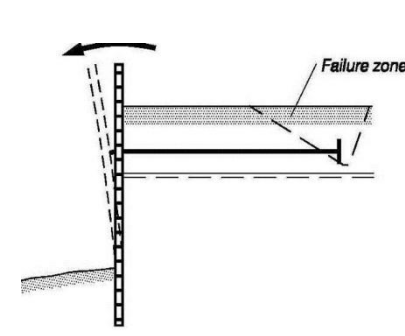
Anchored bulkhead wall – anchor pull-out failure mode
